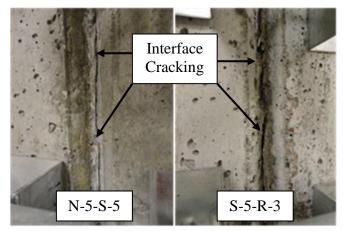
Typical failure crack along shear plane for specimens with smooth interface (N-5-S-5 shown) (left) and roughened interface (S-5-R-3 shown) (right)
